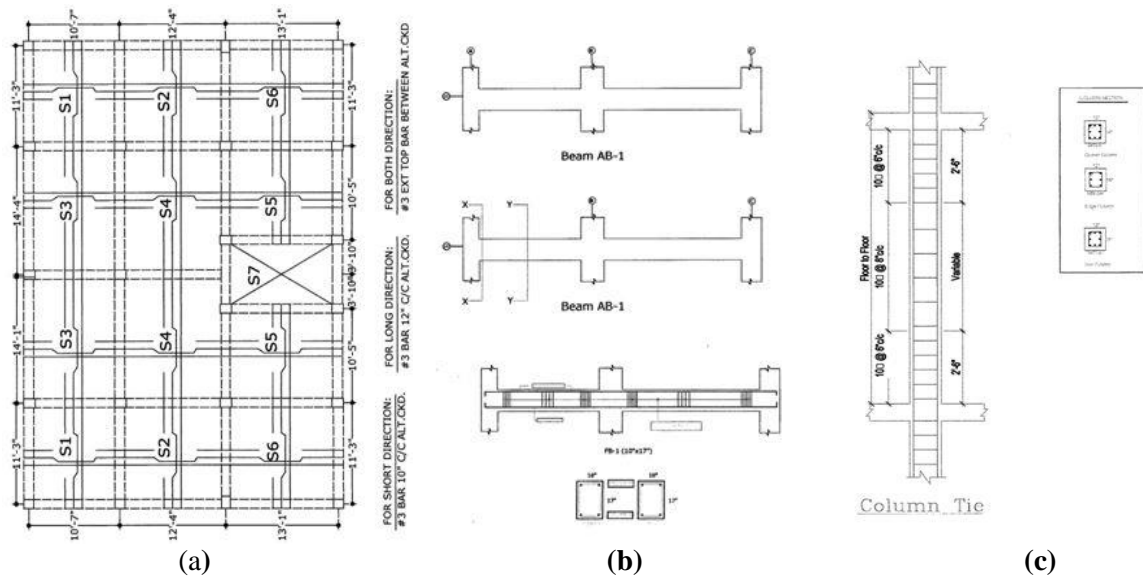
(a) Slab Reinforcement Detail (b) Beam Reinforcement Detail and (c) Column Reinforcement Detail
